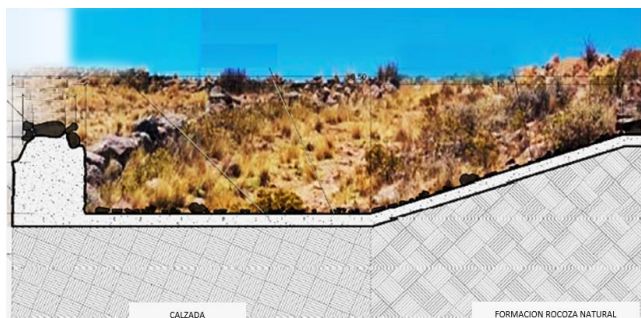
Road section delimited by a wall Segment 1. Source: ATLAS Consulting Project - Adjustment Annex 18-2019.
